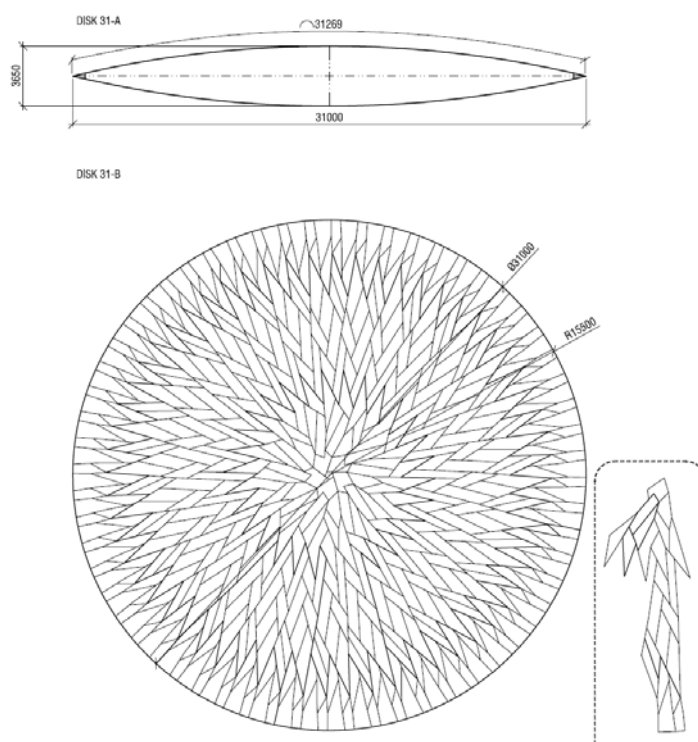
Concept of tessellation of one lens in precast concrete panels
